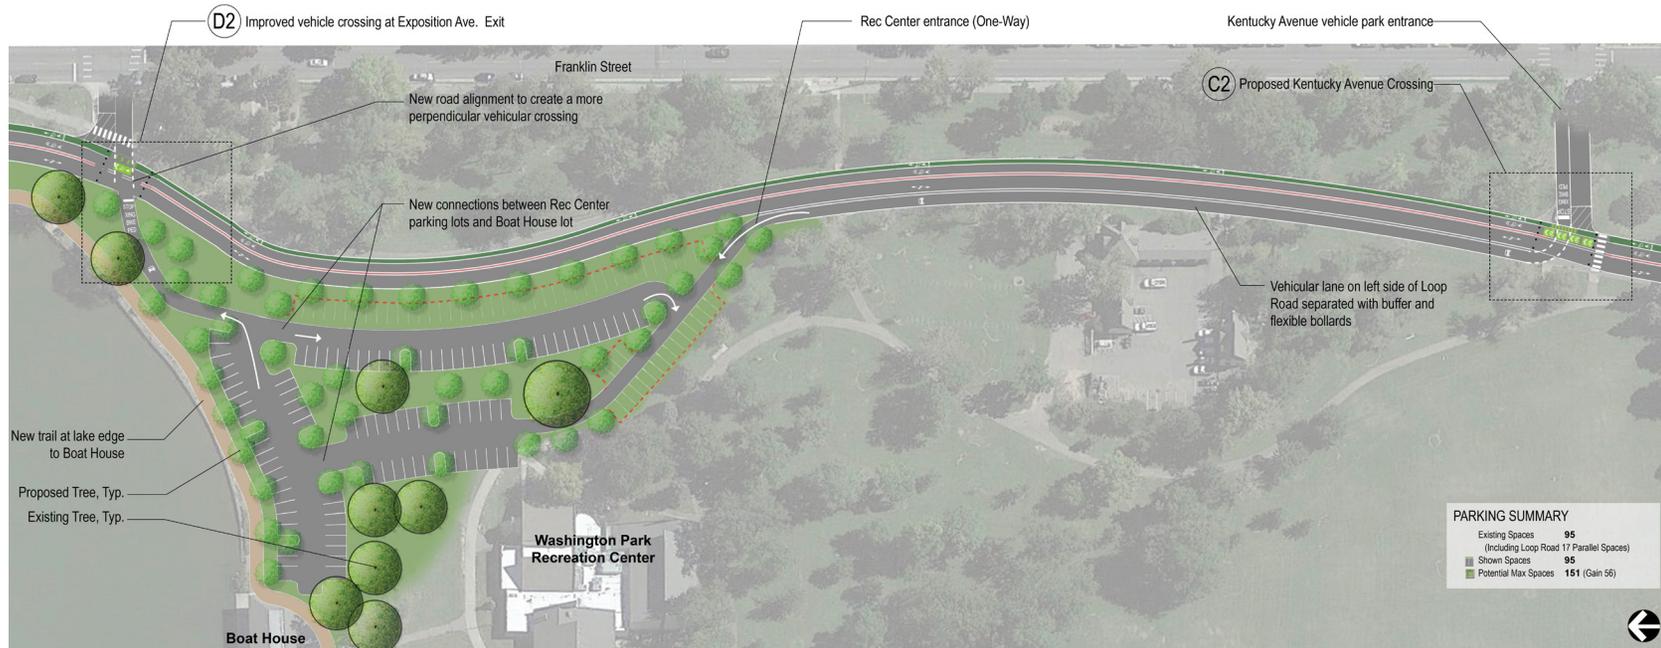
Recommended Improvements Concept: Recreation Center / Boat House Parking
